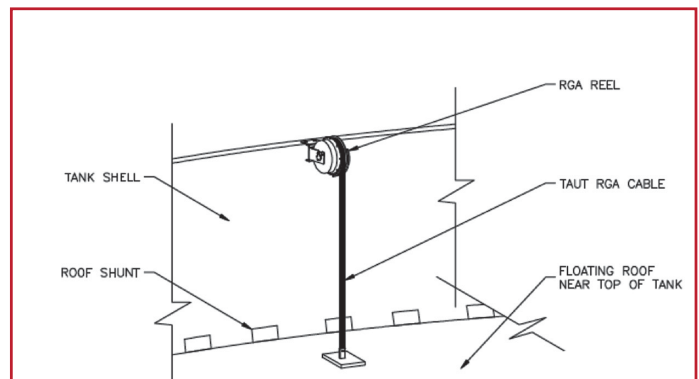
shows the RGA when the roof is high. Note how the RGA cable is as short as possible, thus providing the lowest possible impedance between the roof and shell.
